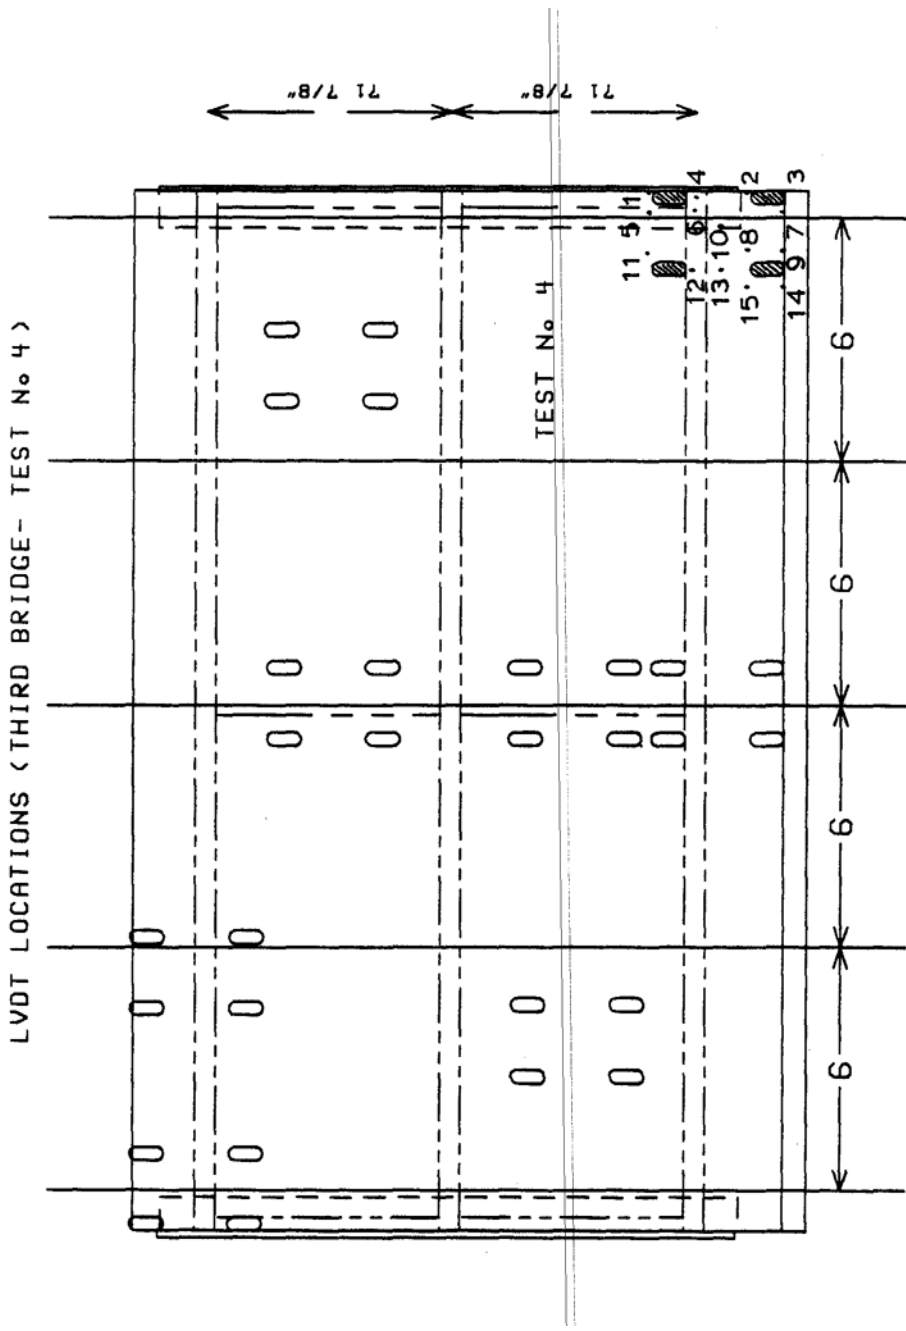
LVDT Locations (Third Bridge - Test No. 4)
